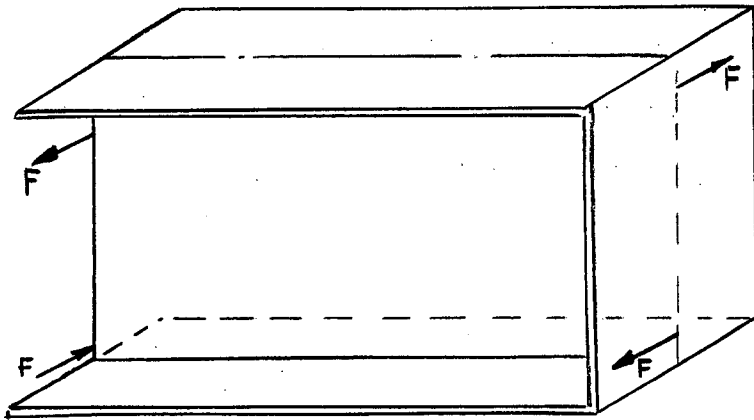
Forces applied to I beam - stiffener arrangement
